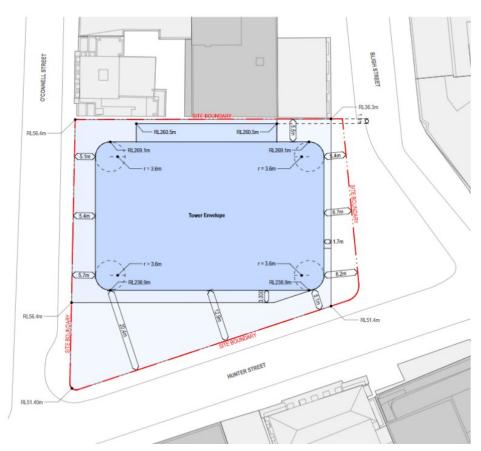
Plan showing the proposed development envelope at a maximum of RL 269.1m
